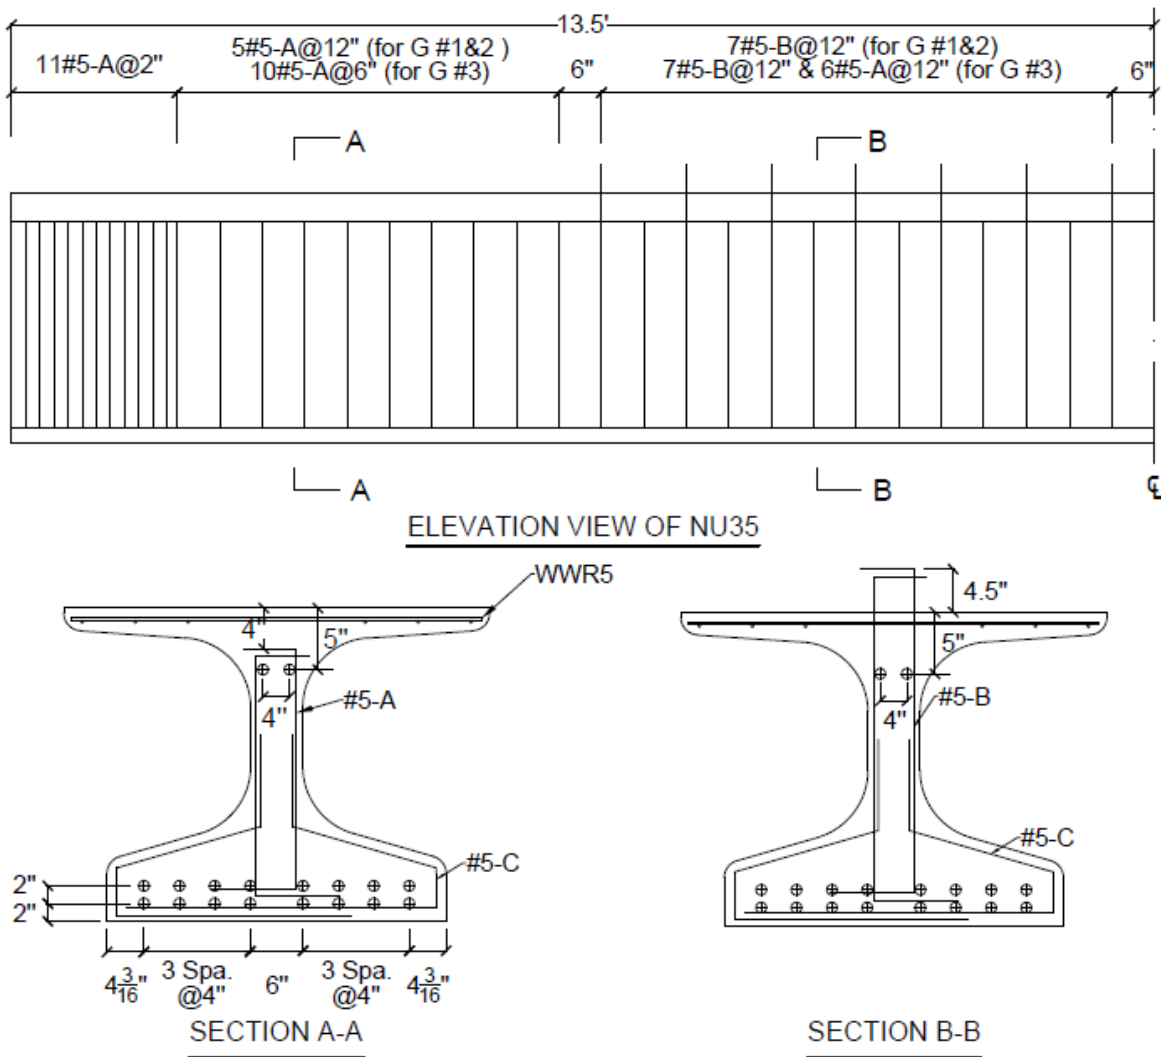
Elevation and Cross Sectional Views of NU35 Girder Specimens
